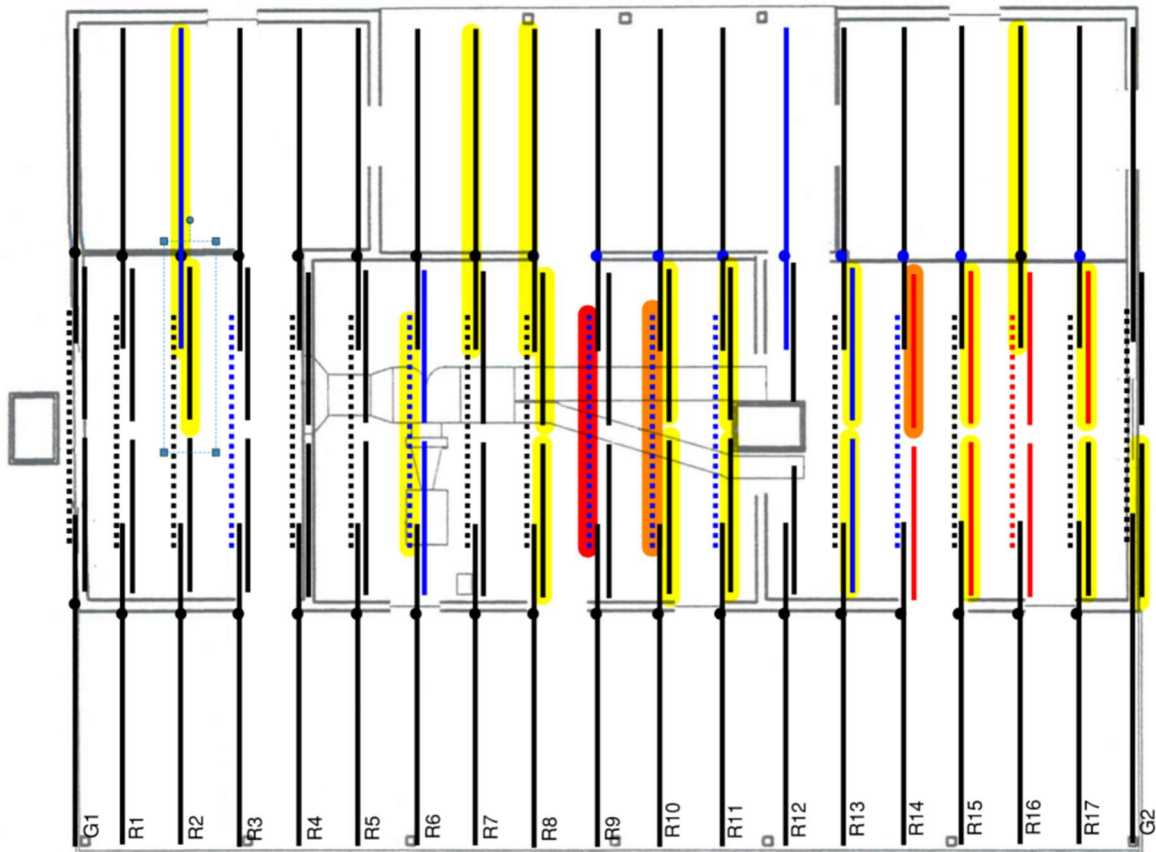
Schematic roof framing plan graphically showing condition ratings for the roof framing members.
